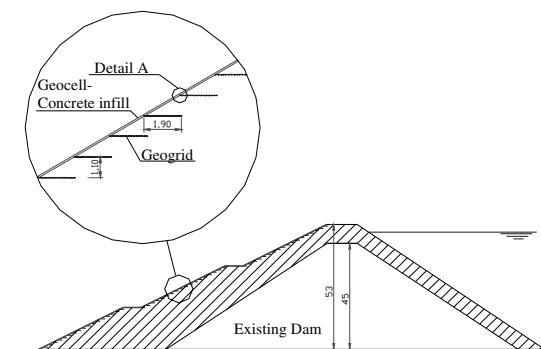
Cross section of the Dam showing different application of geotextiles (Pimental et al 2009)
